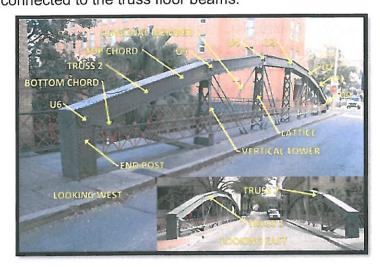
Truss 2 Top Chords, End Posts and Vertical Towers
